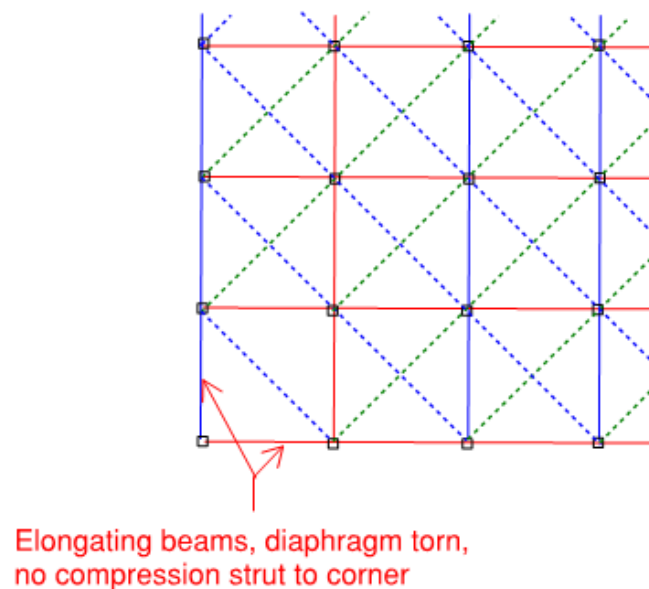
Recommended truss modelling at corner columns to account for anticipated diaphragm damage/deterioration (Holmes, 2015)
